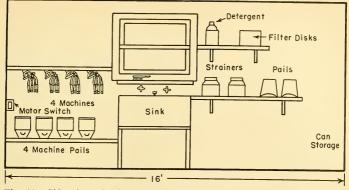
Side view of milk house interior, illustrating one arrangement of sink, shelves, and milking equipment.
